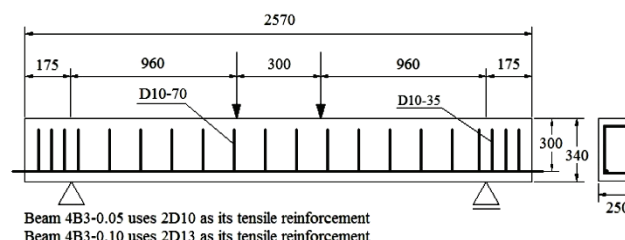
Reinforcement details of beam 4B3-0.05 and beam 4B3-0.10.
